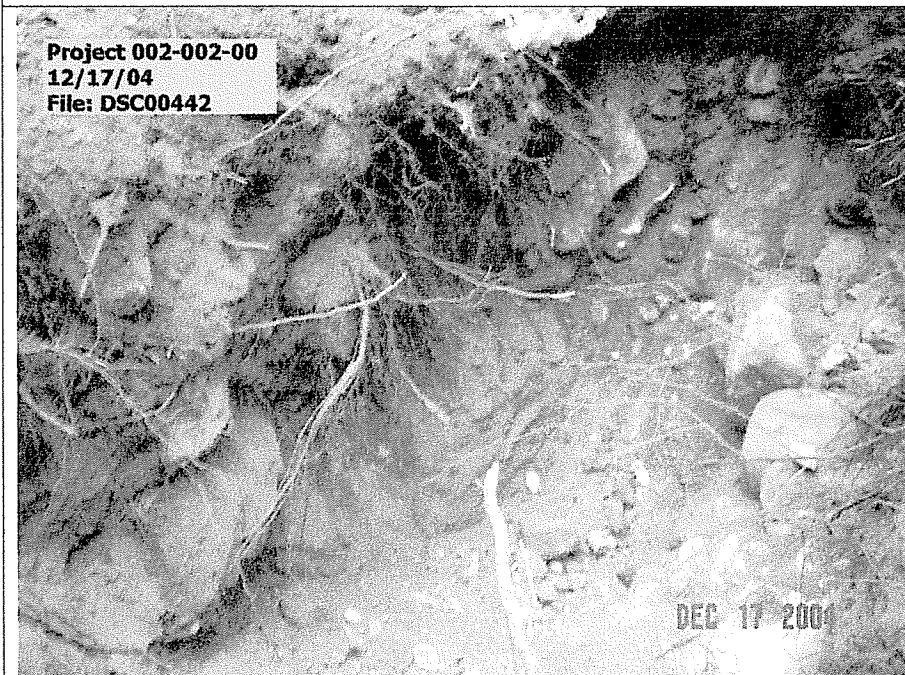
Photo looking at soil excavated from a depth of approximately 4 to 5-1/2 feet in Test Pit 1. Large 1 to 2 foot cobbles became more abundant at approximately 4-feet.
